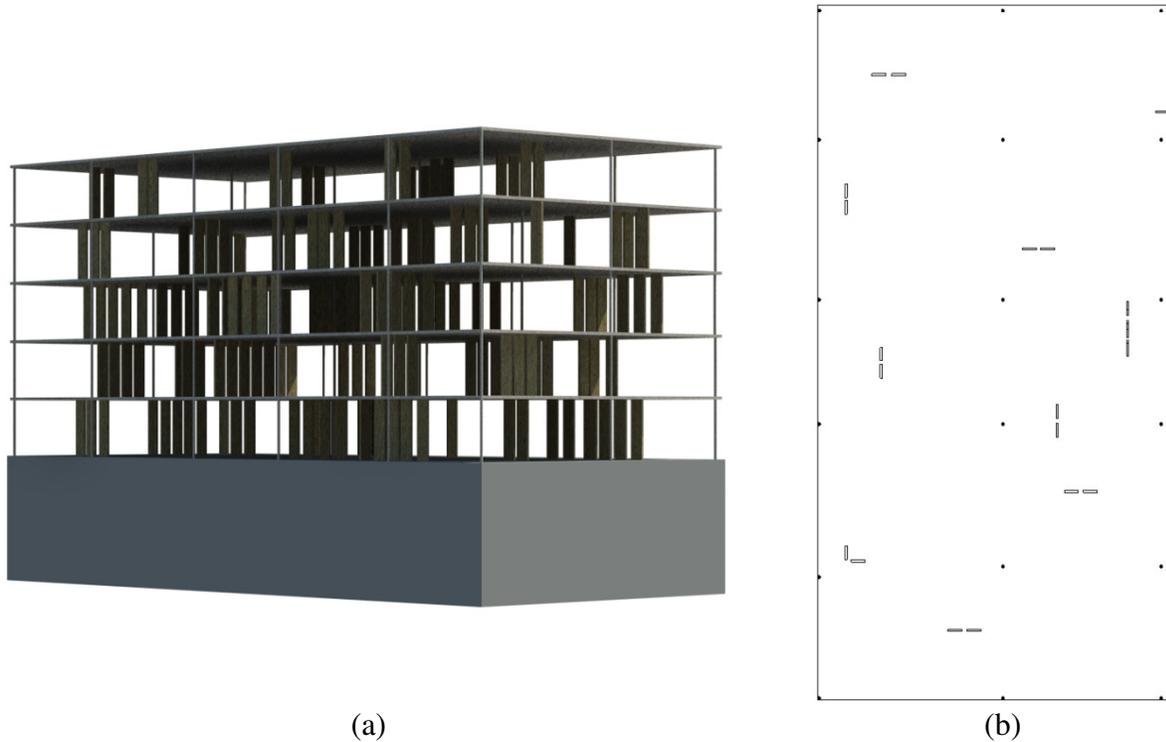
(a) 3D rendering of structure. (b) 6th story placement of shear braces
